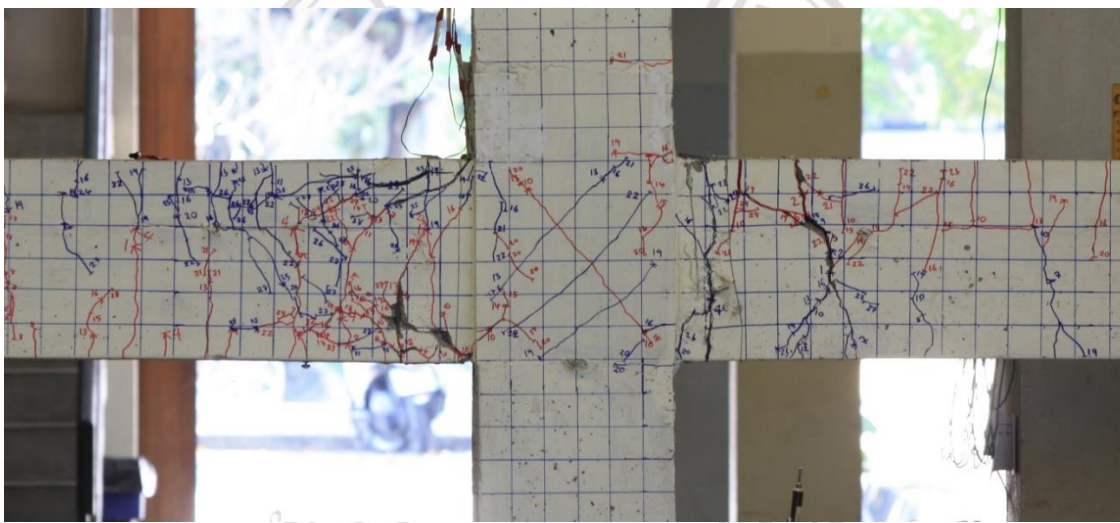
Crack distribution of precast specimen P4 at the end of testing
